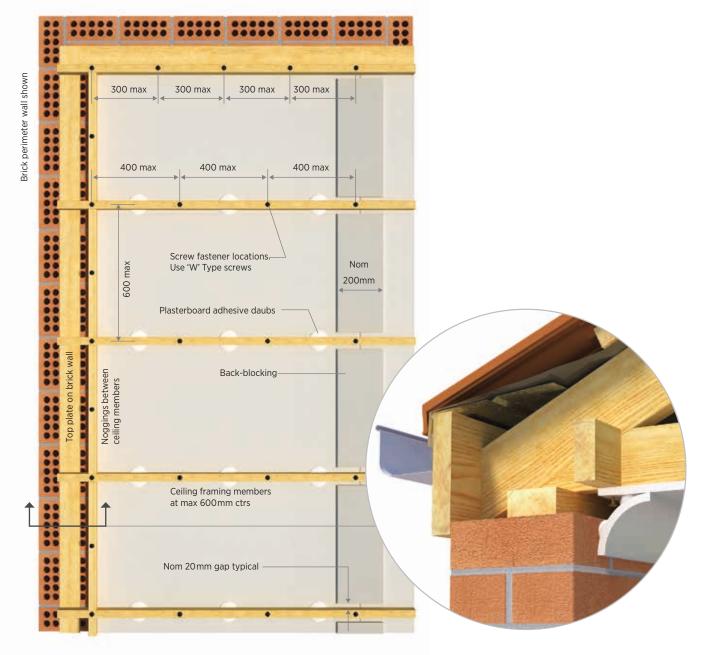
Garage ceiling fixing layout (1200mm wide plasterboard sheets shown)
